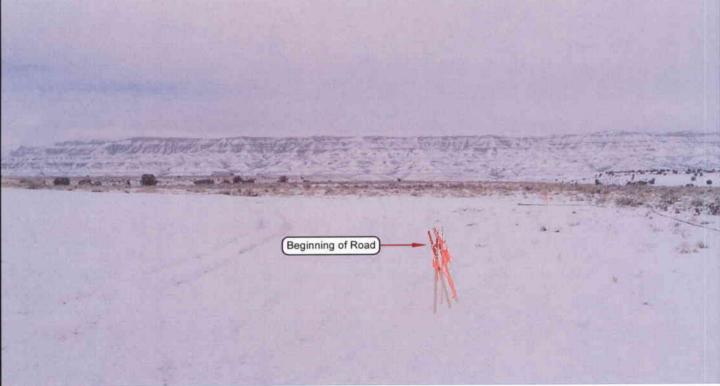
PHOTO VIEW: FROM BEGINNING OF PROPOSED ROAD
